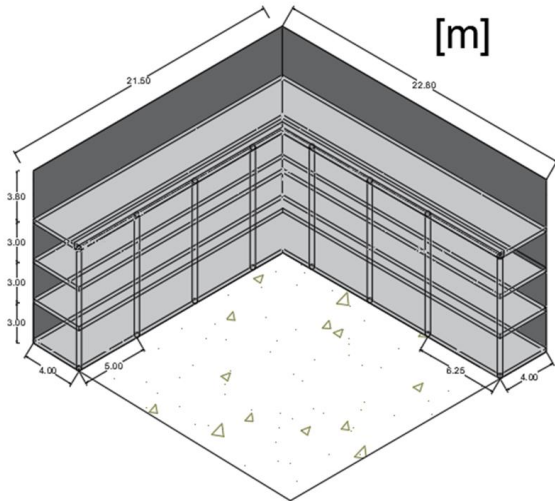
SLAB BANDS SUPPORTING THE CONCRETE WALL
